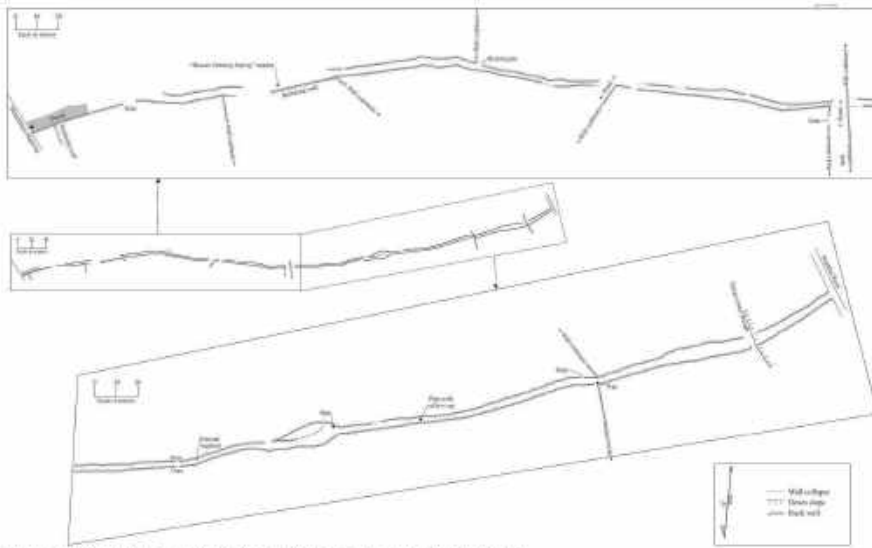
Site 24211 Historic Road Plan View Map (Desilets and Rechtman 2004:15).
